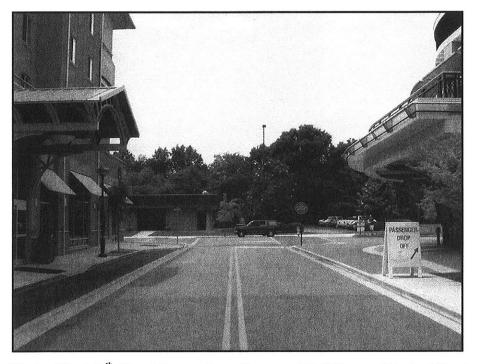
h Street Across from Proposed Exit Ramp at Carter Street
